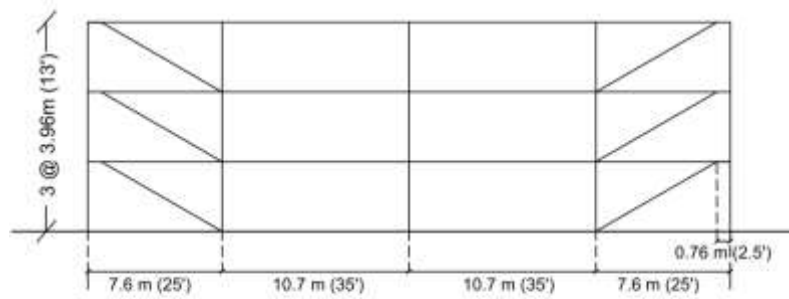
Elevation of 3-story eccentrically braced frame buildings for CEBF-D type
